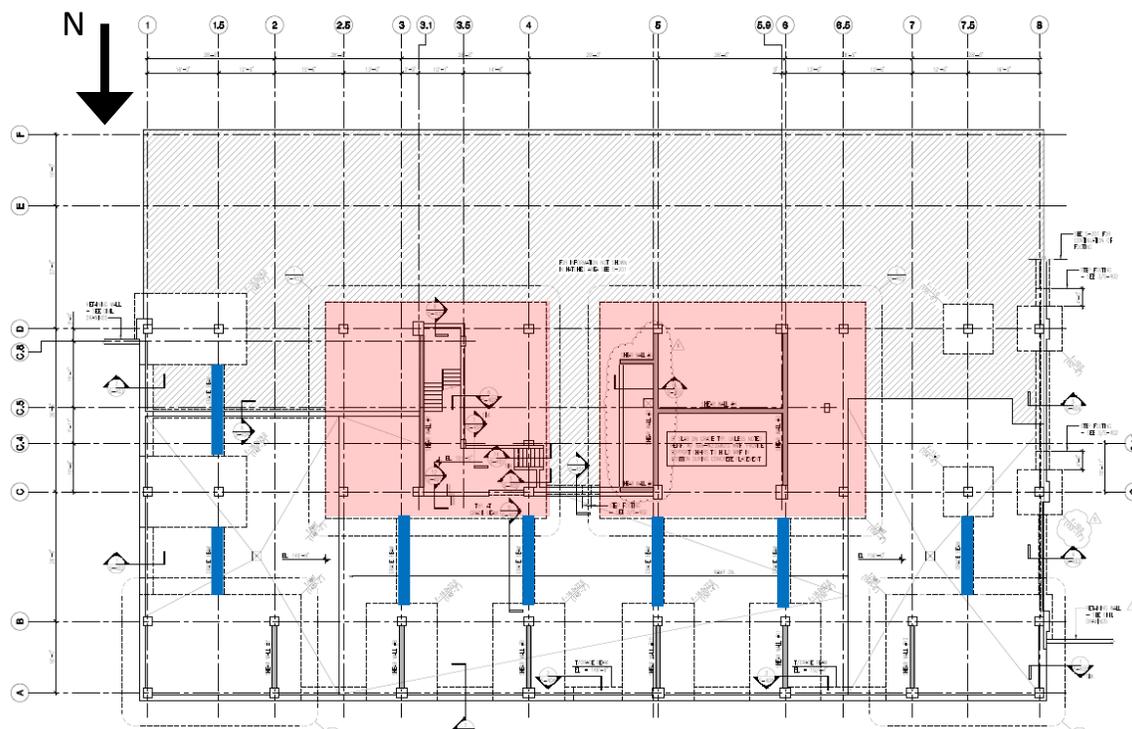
Foundation Plan (Level P0) Showing 48" Thick Mat Foundations Shaded in Red
